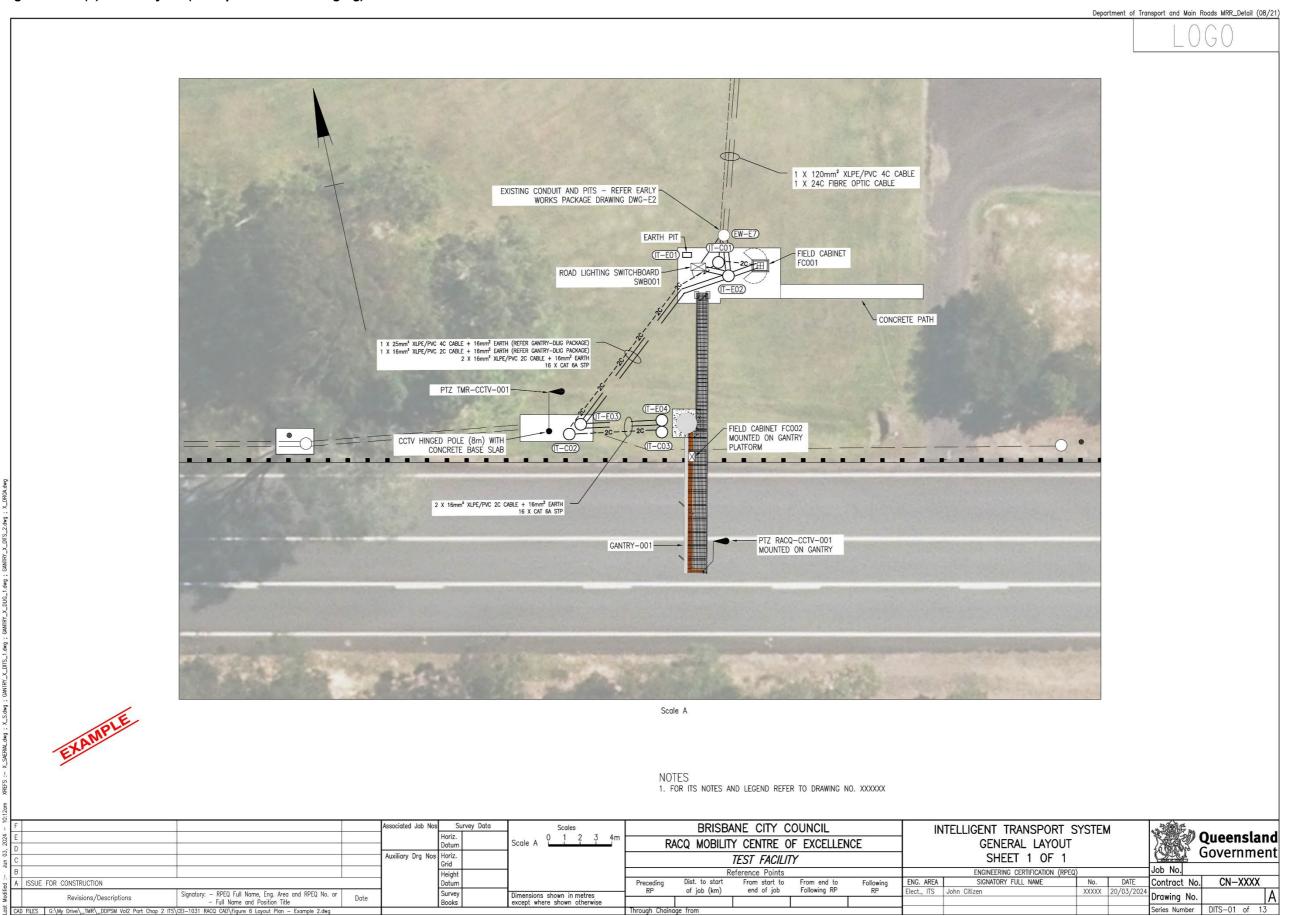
(c) – ITS layout (example 3 - with drawing key)
